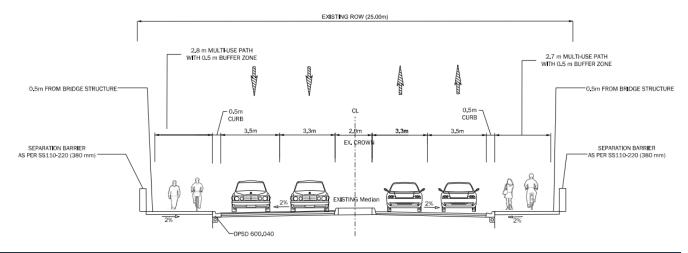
CROSS-SECTION AT SPRING CREEK CULVERT
